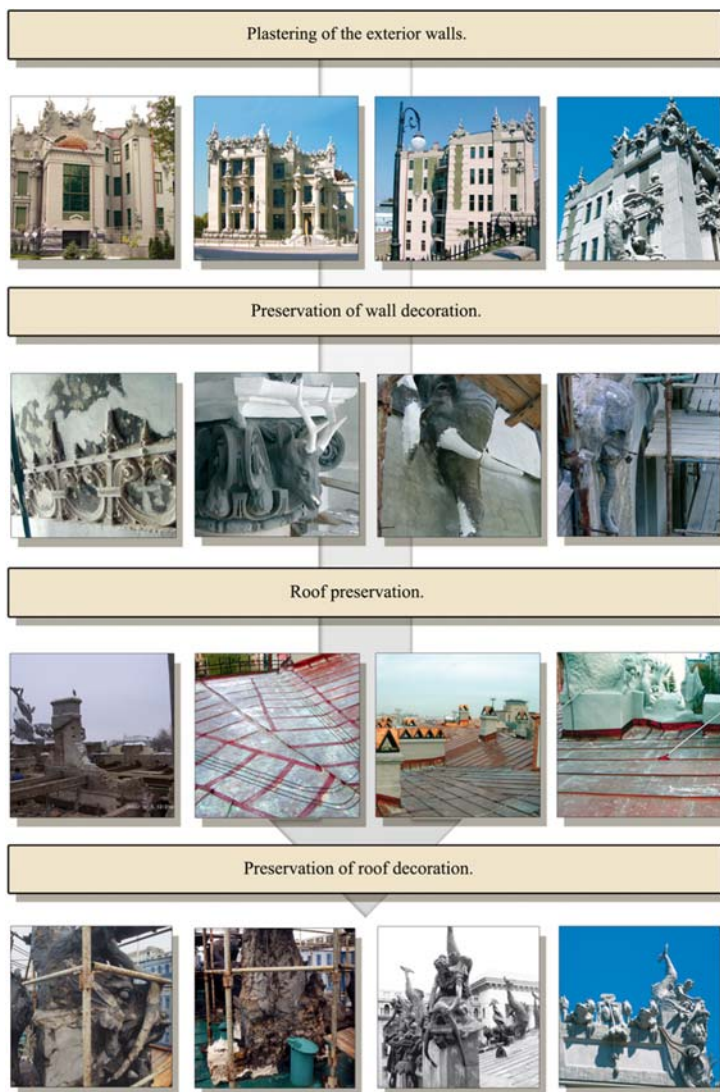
The problems and restoration methods of the building of architect W. Horodecki at 10 Bankova Street in Kyiv
